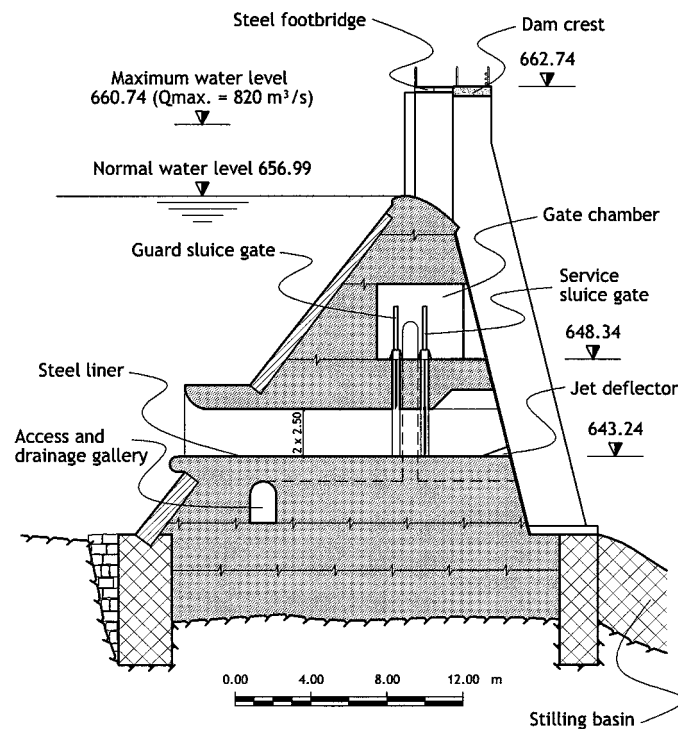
Typical cross section of the new bottom outlet on the left dam side.
